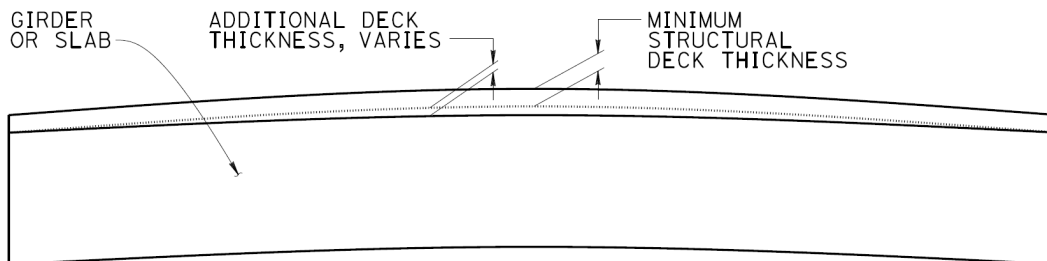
Elevation Showing Possible Deck Thickness Variation on Adjacent Box Girders and Slabs
